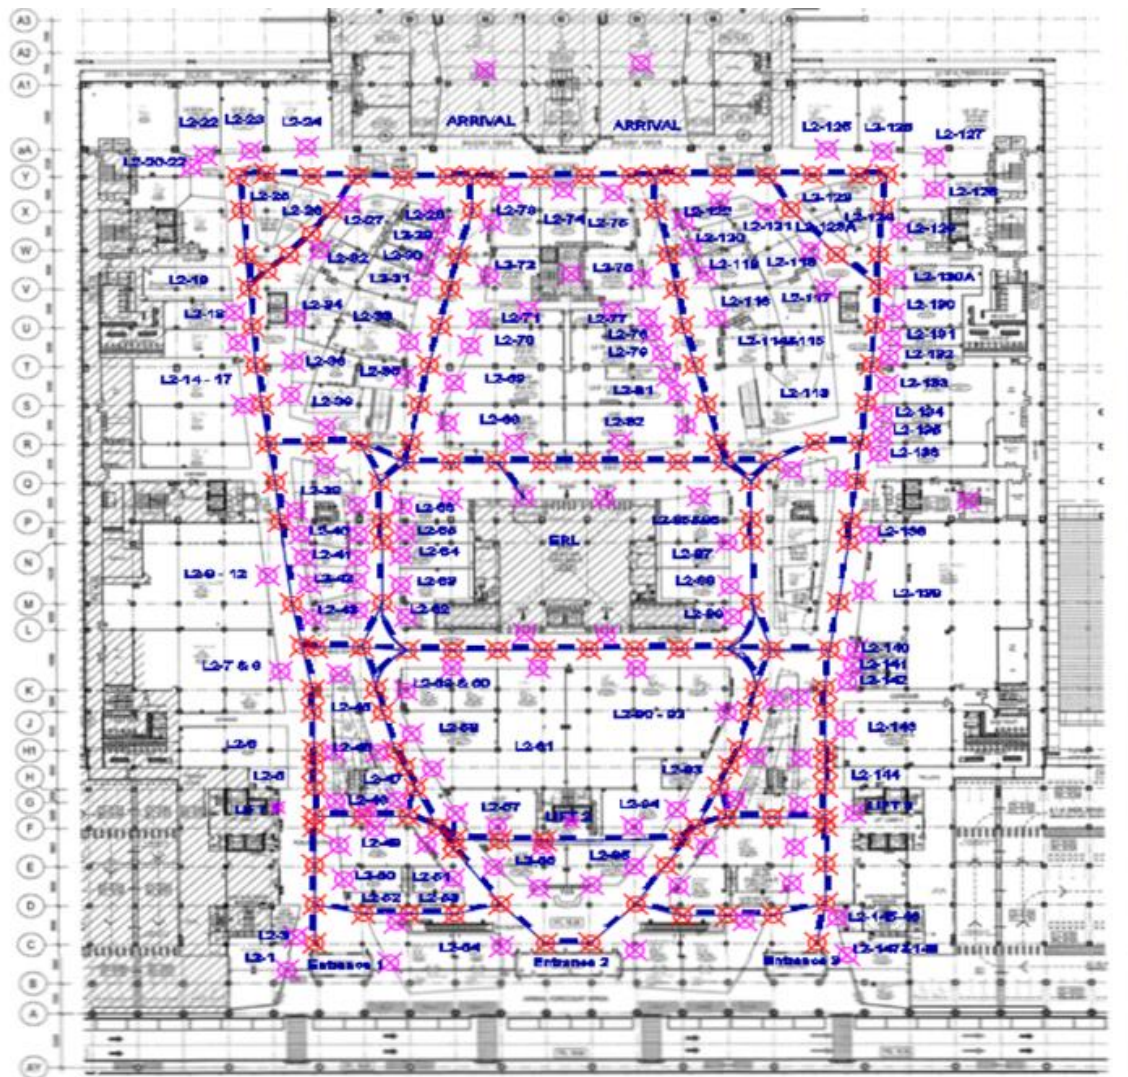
AutoCAD drawing node and distance of floor plan level 2 in gateway KLIA2
